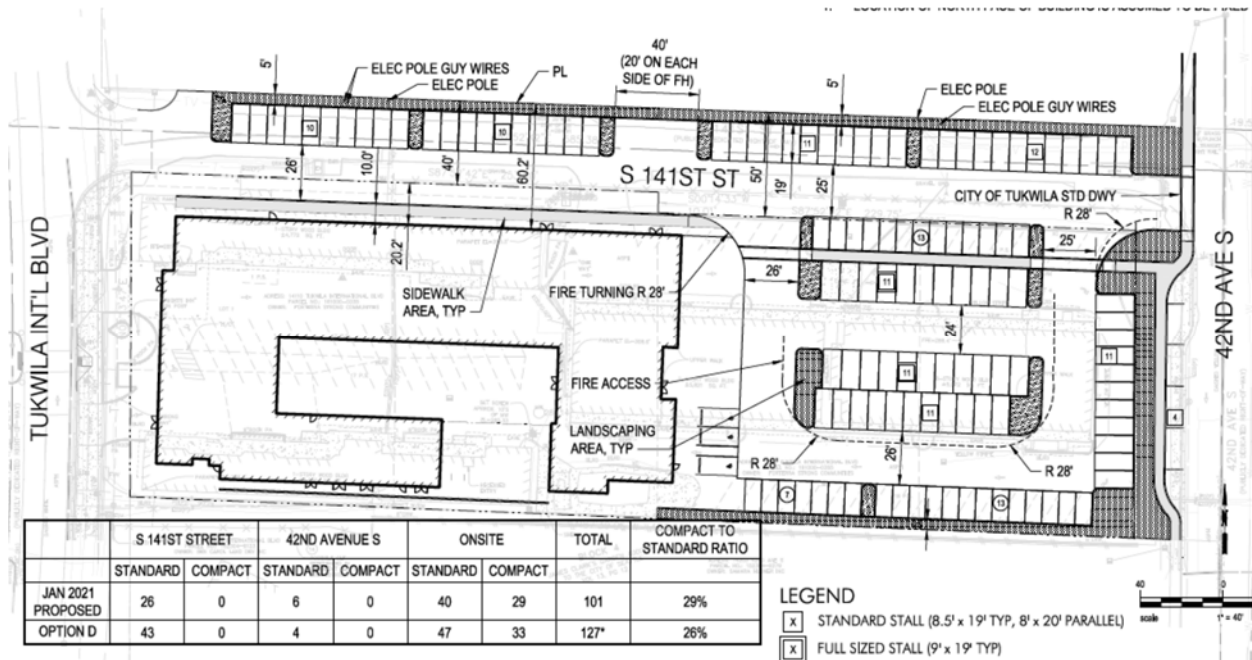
, Conceptual Design of Parking Along S. 141st and 42nd Ave S².
